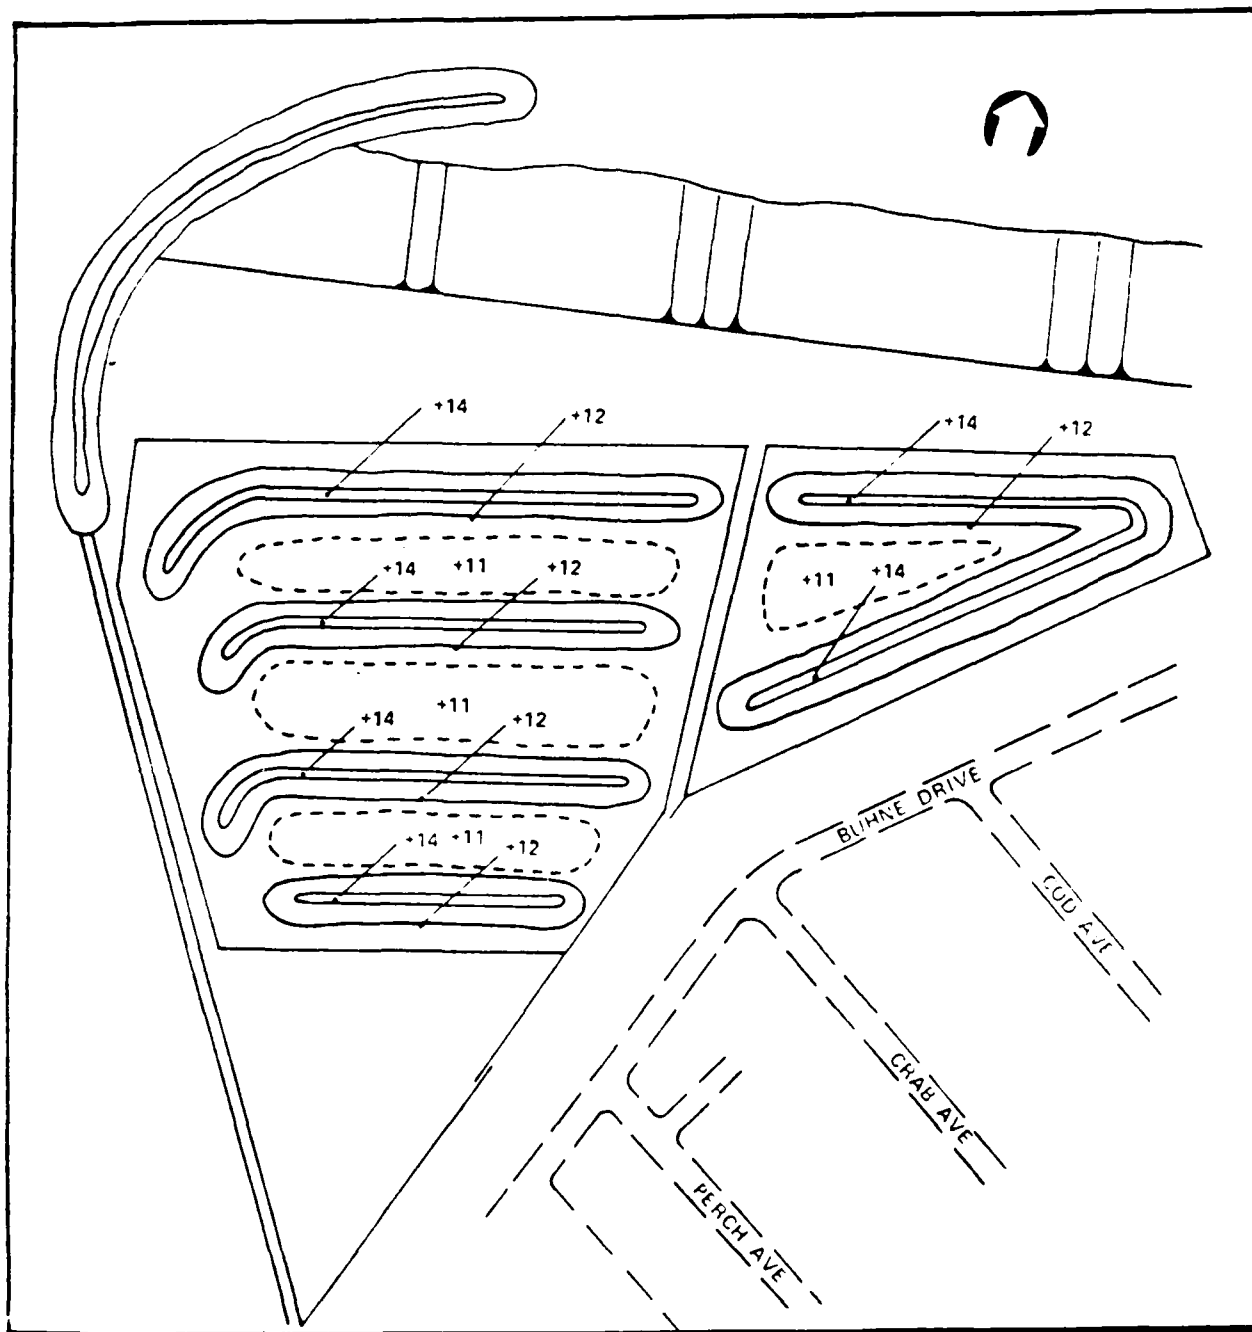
Site Plan Showing Surface Features and Elevations (MLW)
